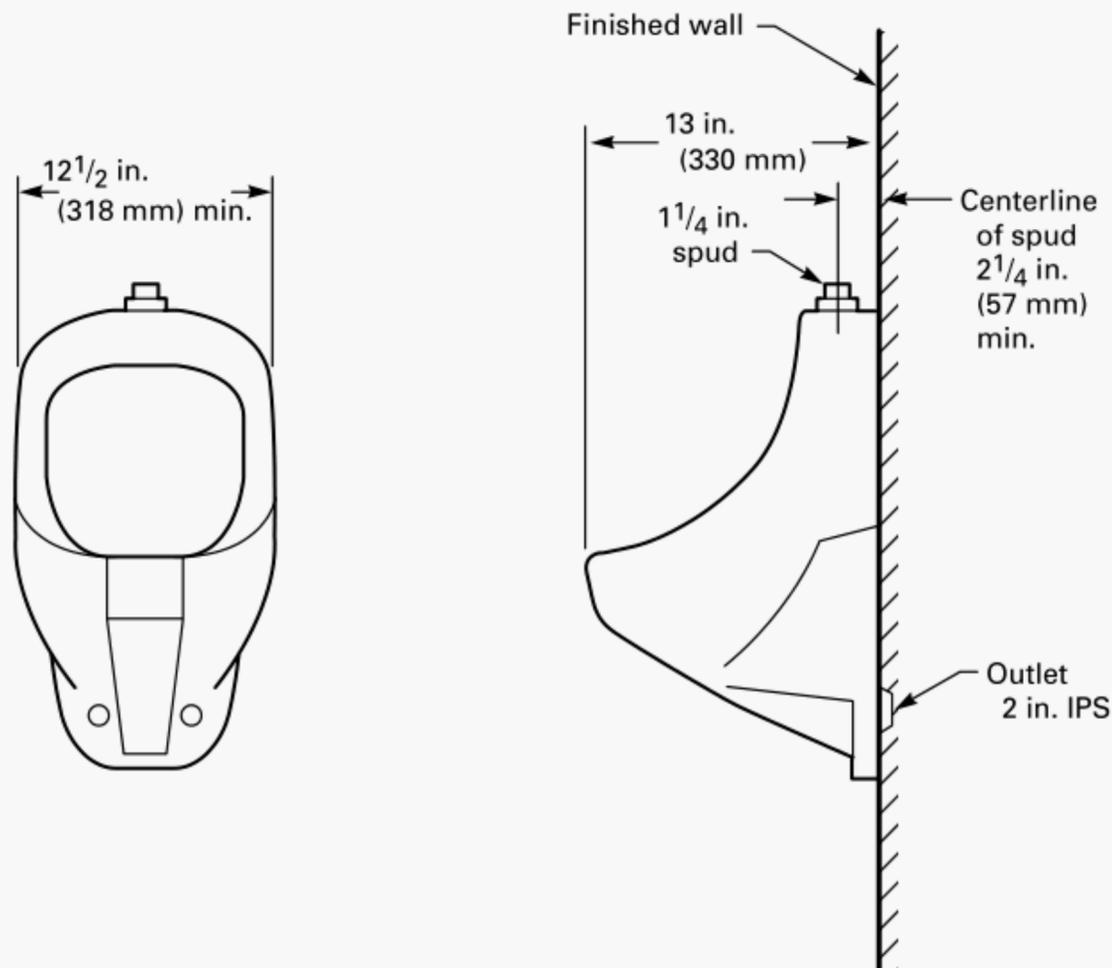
Wall-Mounted Siphon-Jet Urinal
